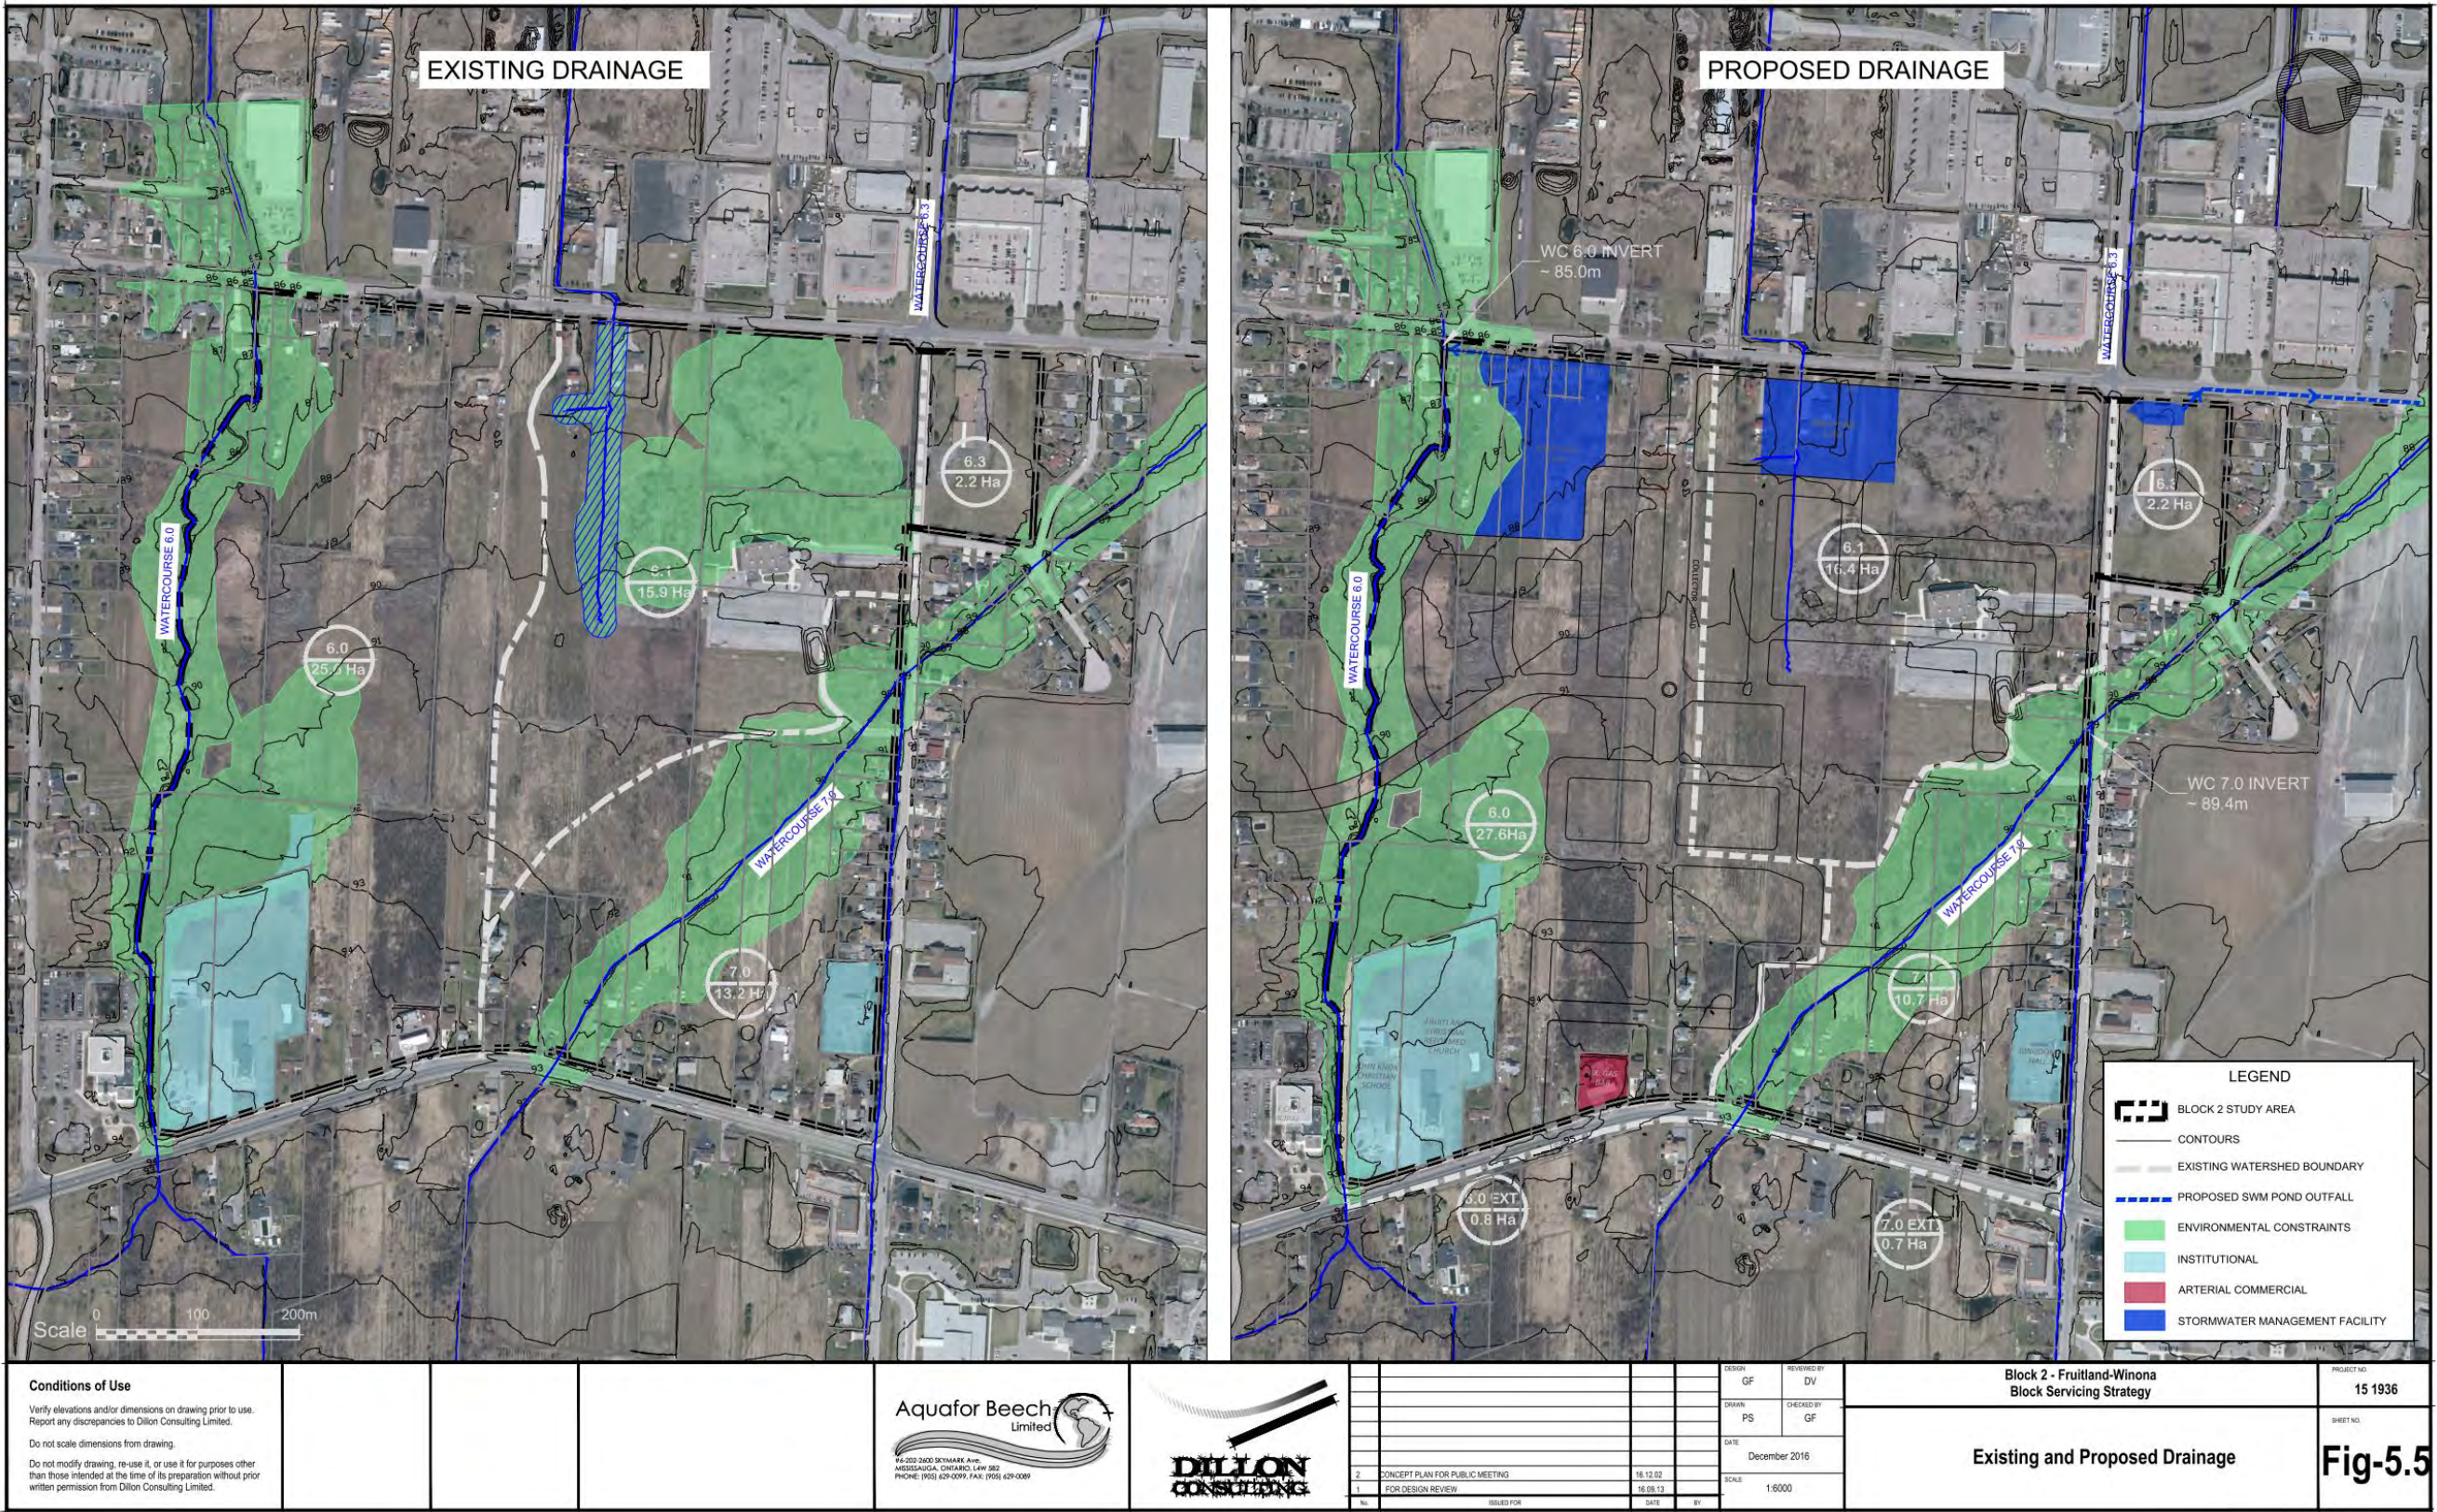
Stormwater Servicing (Existing and Proposed Drainage)
